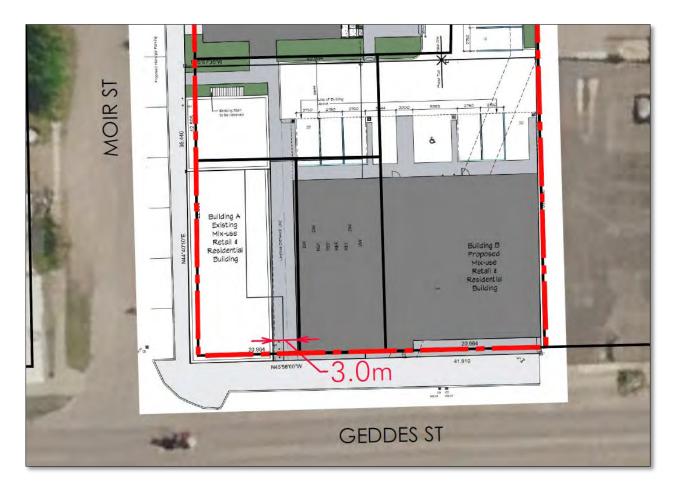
Excerpt of the site plan identifying distance between construction and adjacent Connon Block (Source: MHBC, 2021).
